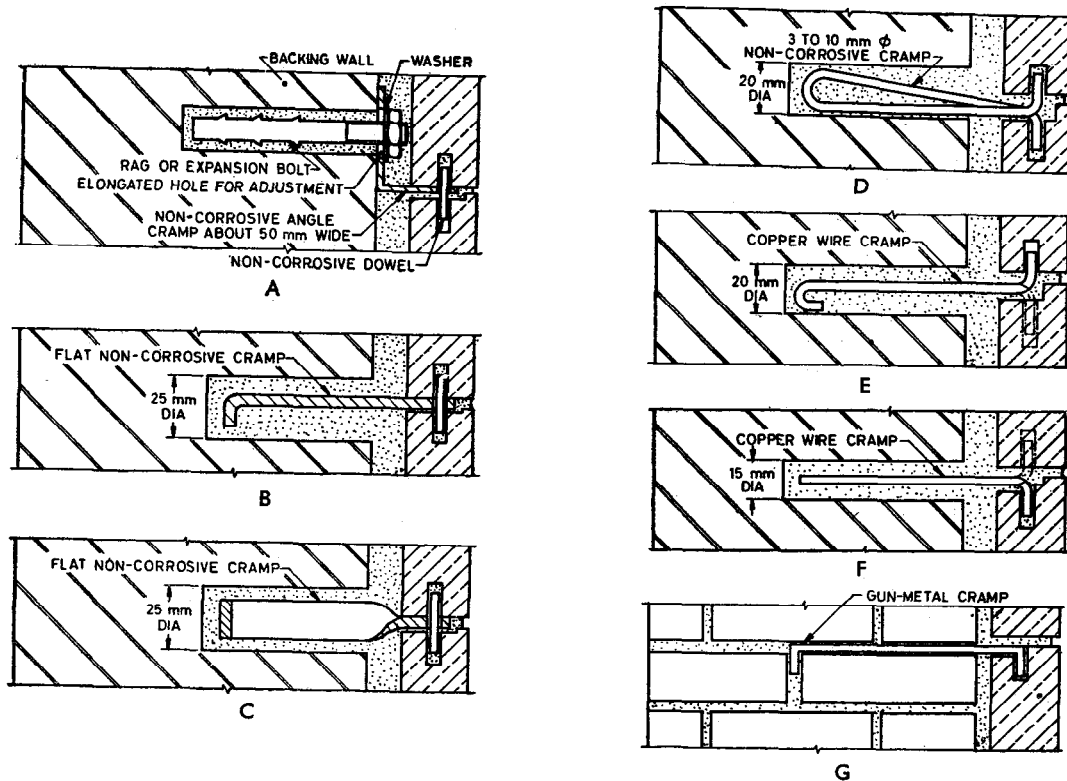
TYPES OF CRAMPS FOR STONE FACINGS
